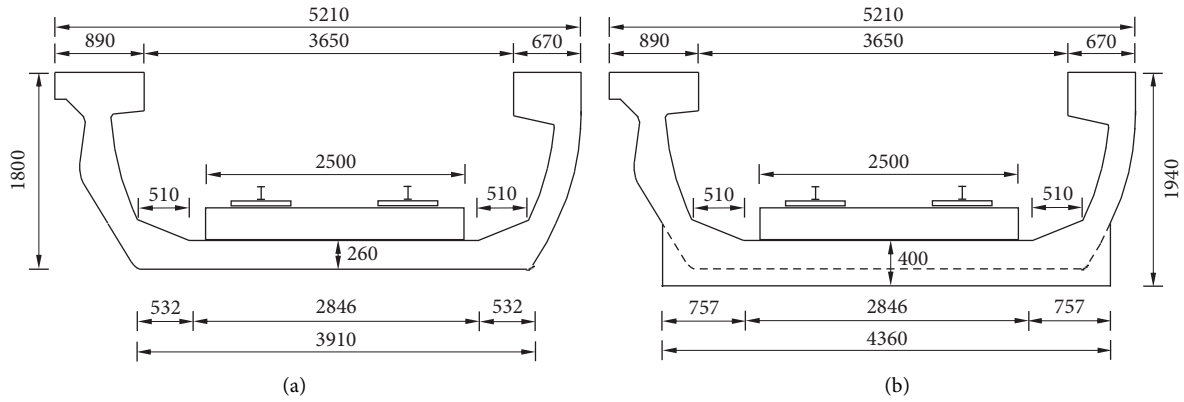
Cross sections of the 30 m U-shaped girder (unit: mm): (a) midspan and (b) girder end.
